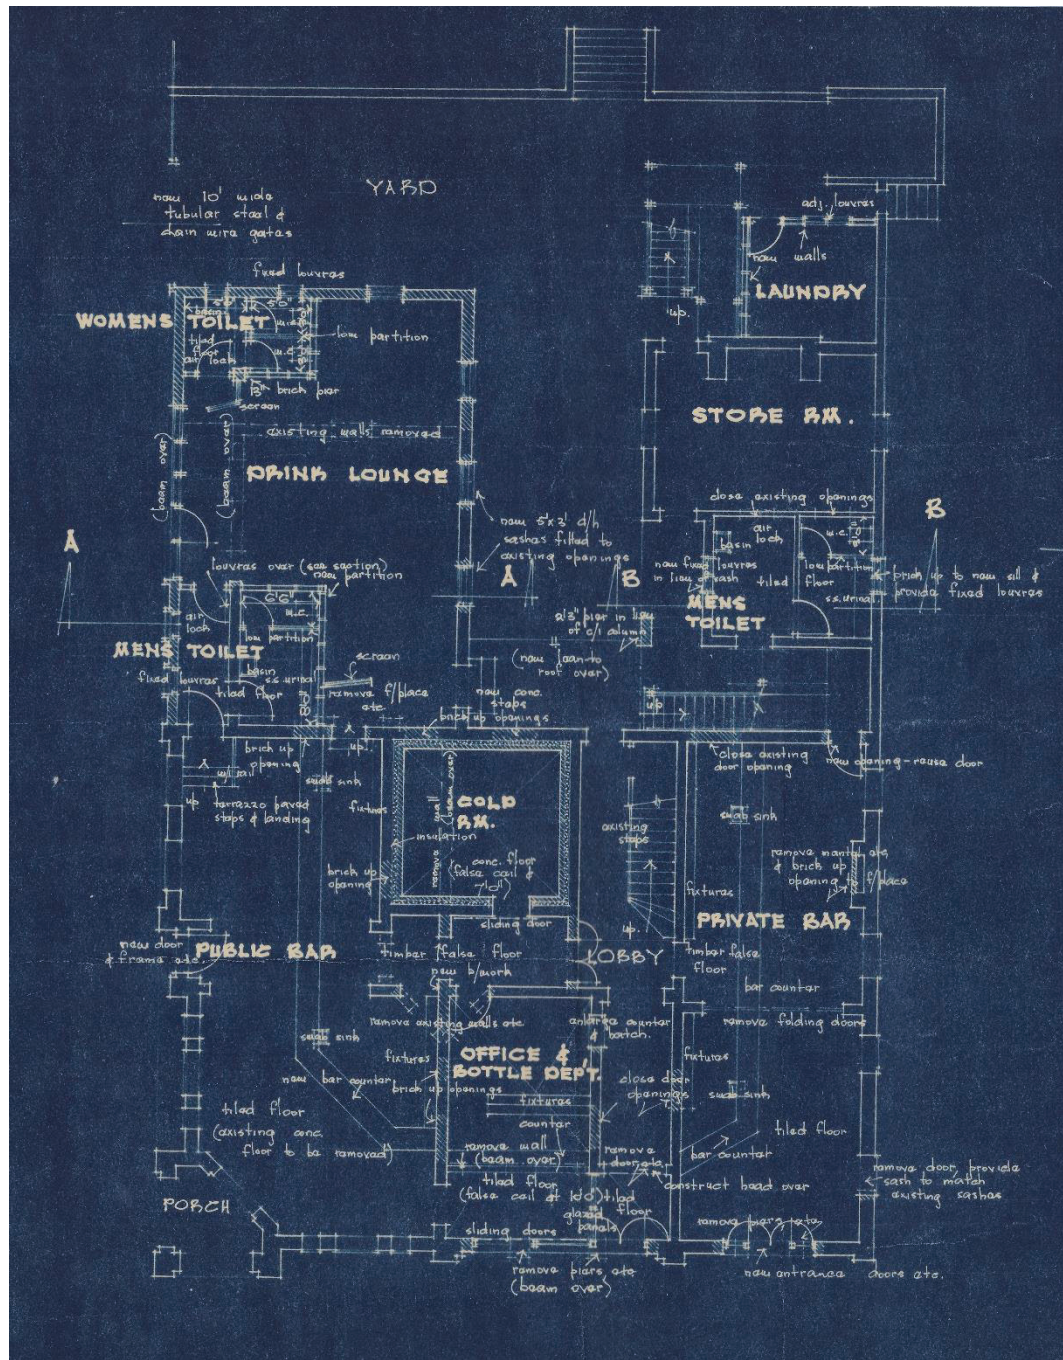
Ground floor plan showing 1958 alterations and additions
